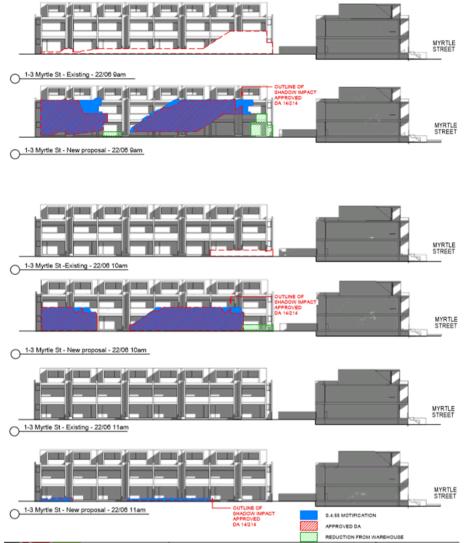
Elevational shadow diagrams at 1-3 Myrtle Street (9am to 11am winter solstice)
